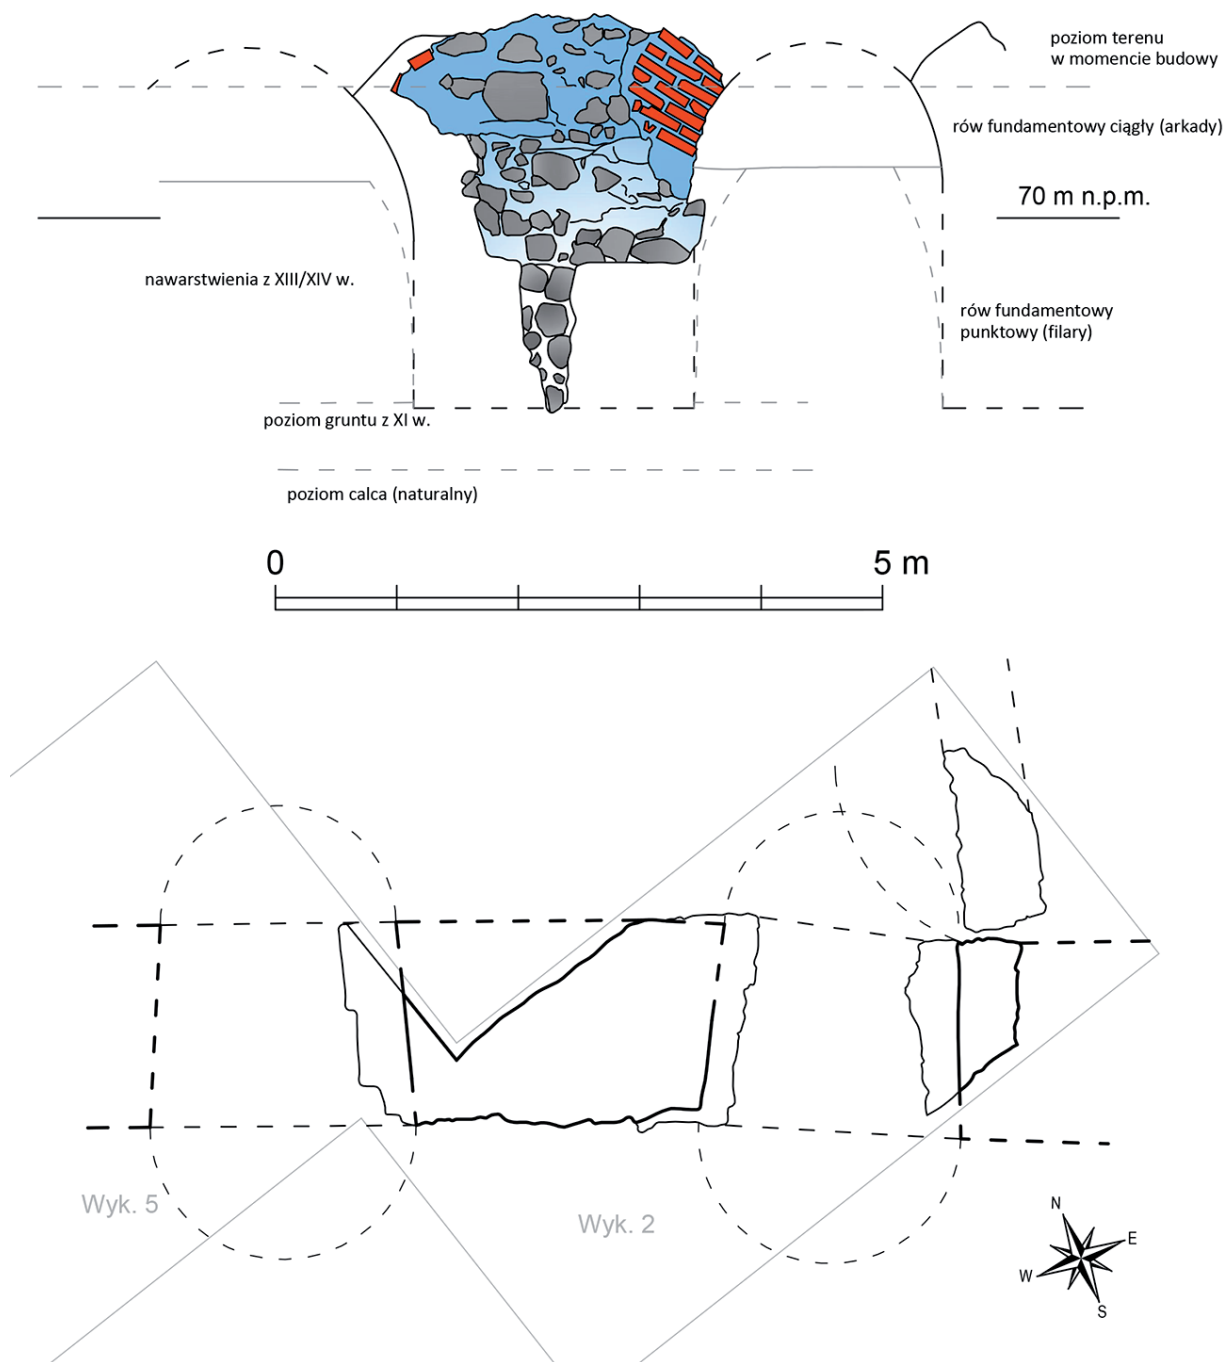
Unisław – arcade foundation of the castle house, discovered in trench No. 2. Drawing by B. Wasik.
